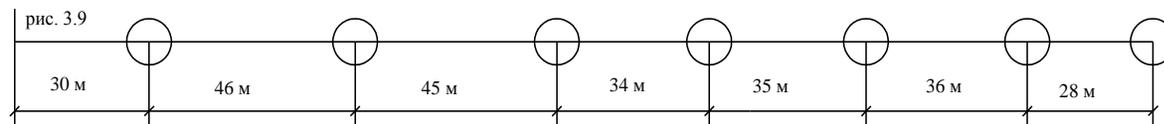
Schematic layout of lighting towers in Ul. Sovetskaya (from the intersection with Ul. Pionerskaya to the intersection with Ul. Volchetskogo), City of Novogradok (layout – one-sided, luminaire installation altitude – 8.5 m)
